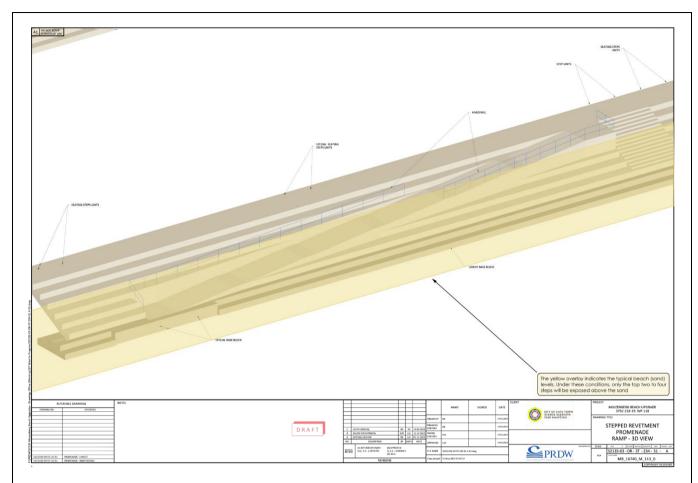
Three dimensional render of the central section of the proposed stepped concrete revetment with the universal beach access ramp. Most of the structure will remain buried under the sand. Under typical beach levels only the top two to four steps will be exposed (as indicated by the yellow overlay). The remaining structures allows for equal functionality during lower beach level scenarios.
